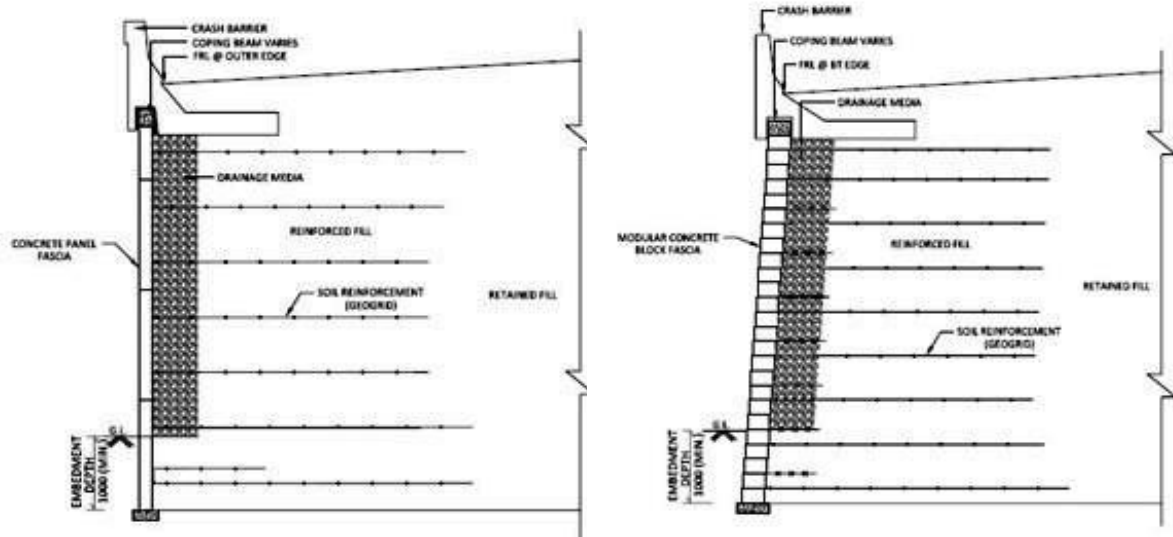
Reinforced soil wall with concrete panel fascia
